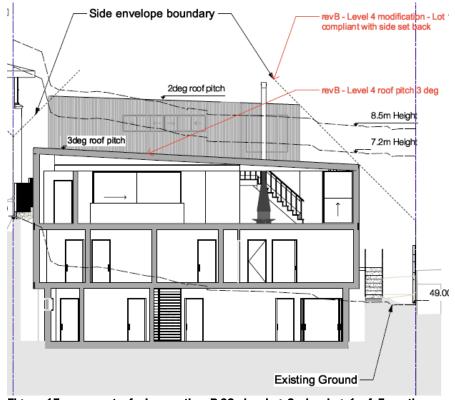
excerpt of plan section P-02 drawing 2 showing 1 of 5 sections depicting the side boundary envelope plane for the proposed dwelling house on approved Lot 1 $\,$
